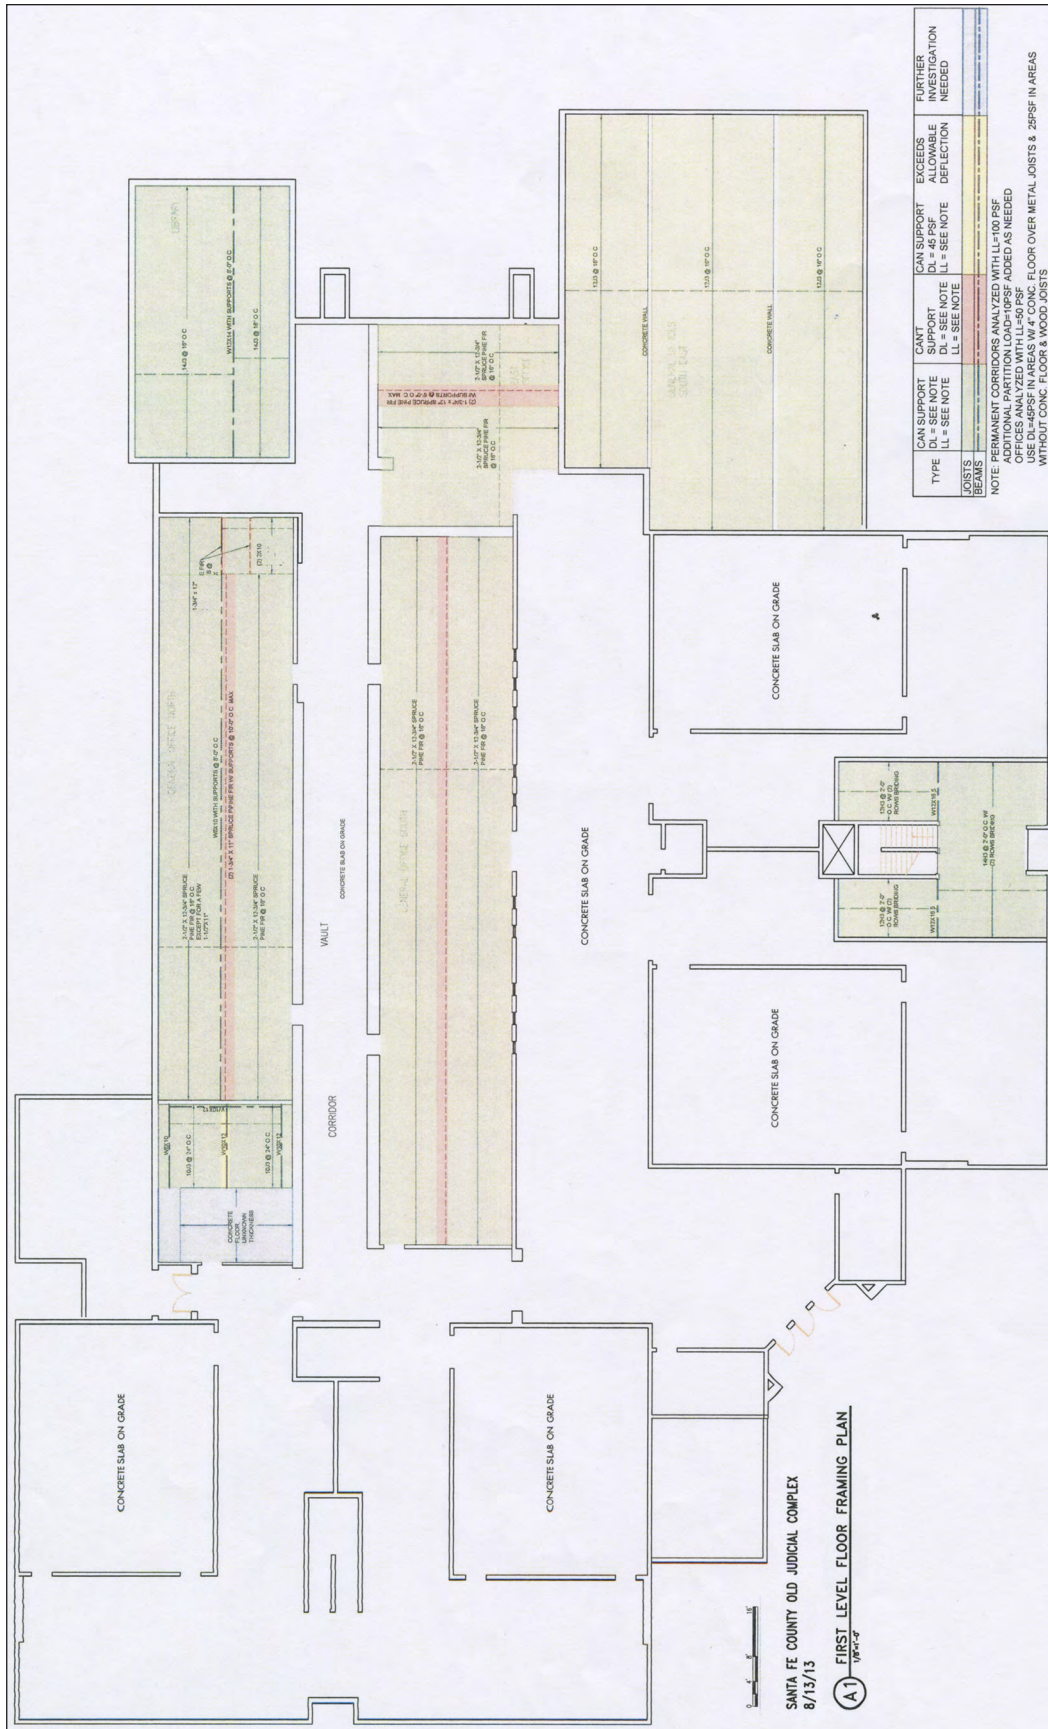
Plan of the old Judge Steve Herrera Judicial Complex building showing the location of crawl spaces.
